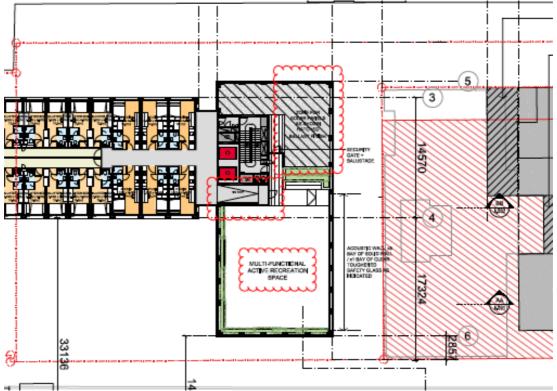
Proposed Level 10 Plan – Retention of rooftop space (extract from DA03.010_L10) Source: Bates Smart
